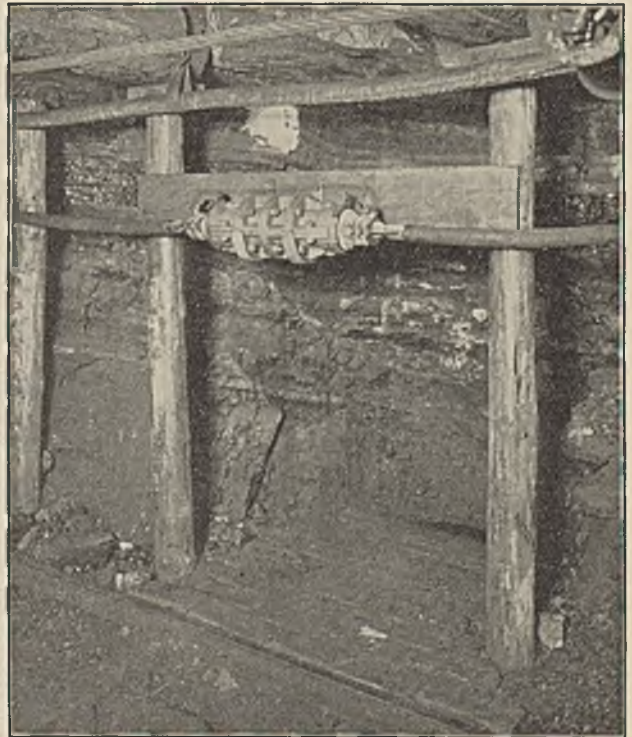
Cable Joint made by utilising detachable dividing boxes.
